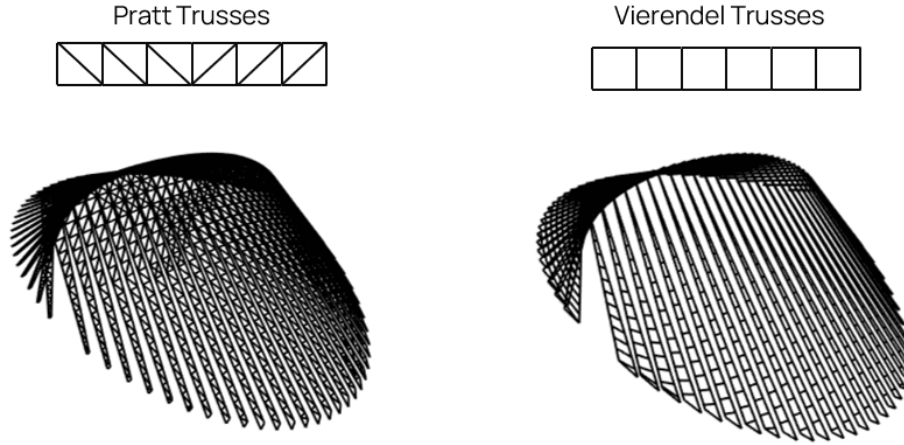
Detail of the steel roof with Pratt and Vierendeel truss systems.
